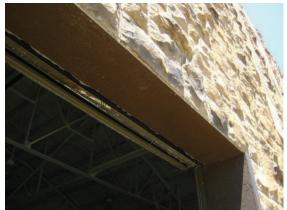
Brown painted overhead door frame in Room 1, Side A – LBP.
